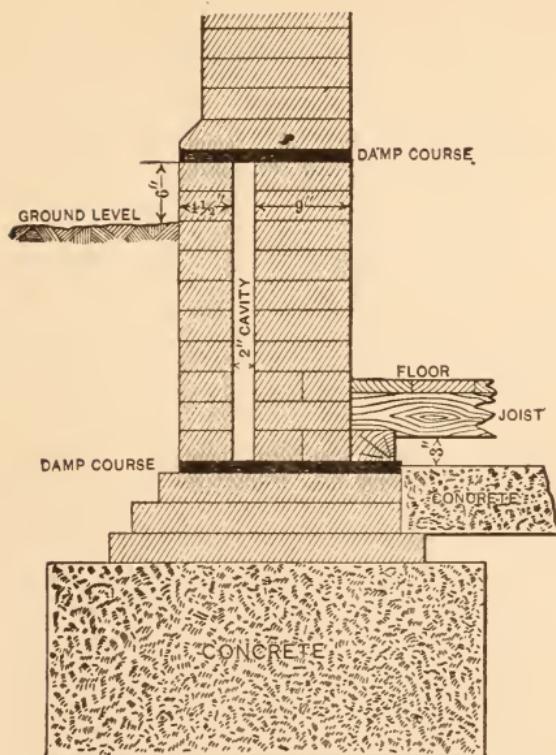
CONCRETE FOUNDATION AND DAMP-PROOF COURSE.
